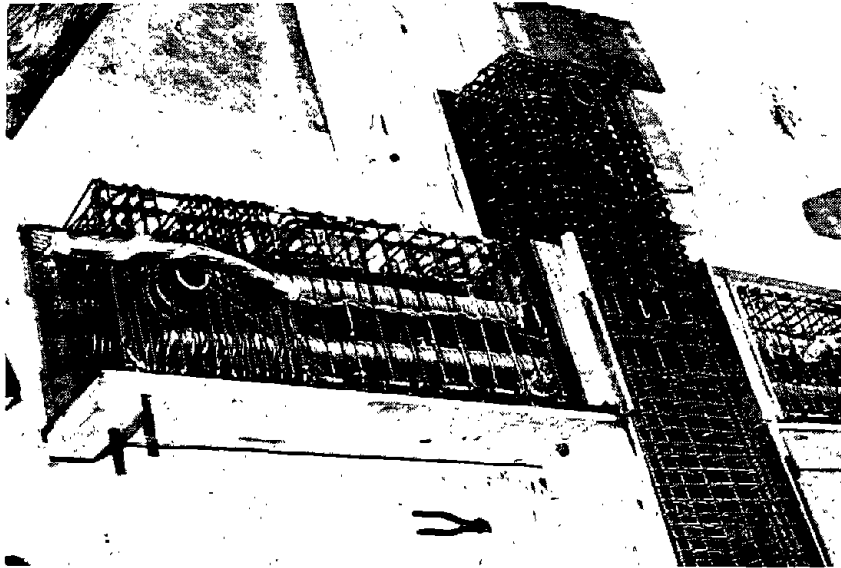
Steel cages for specimen C-P-Z4 and D-P-Z4.
